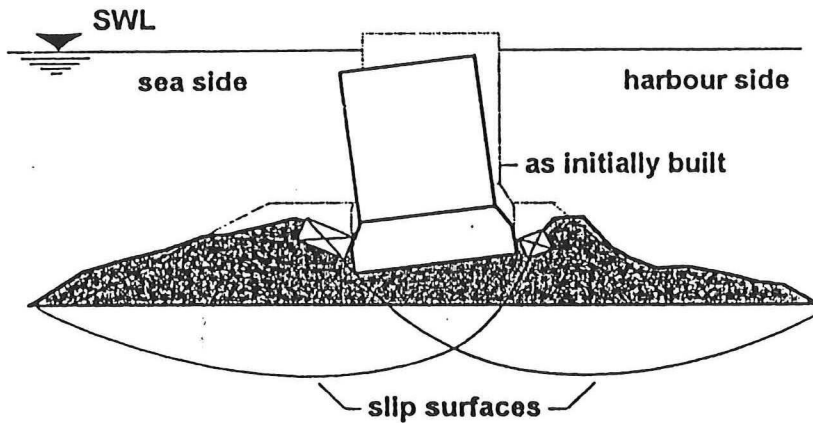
Shear failure of the foundation of Algiers' Mustapha Breakwater.
